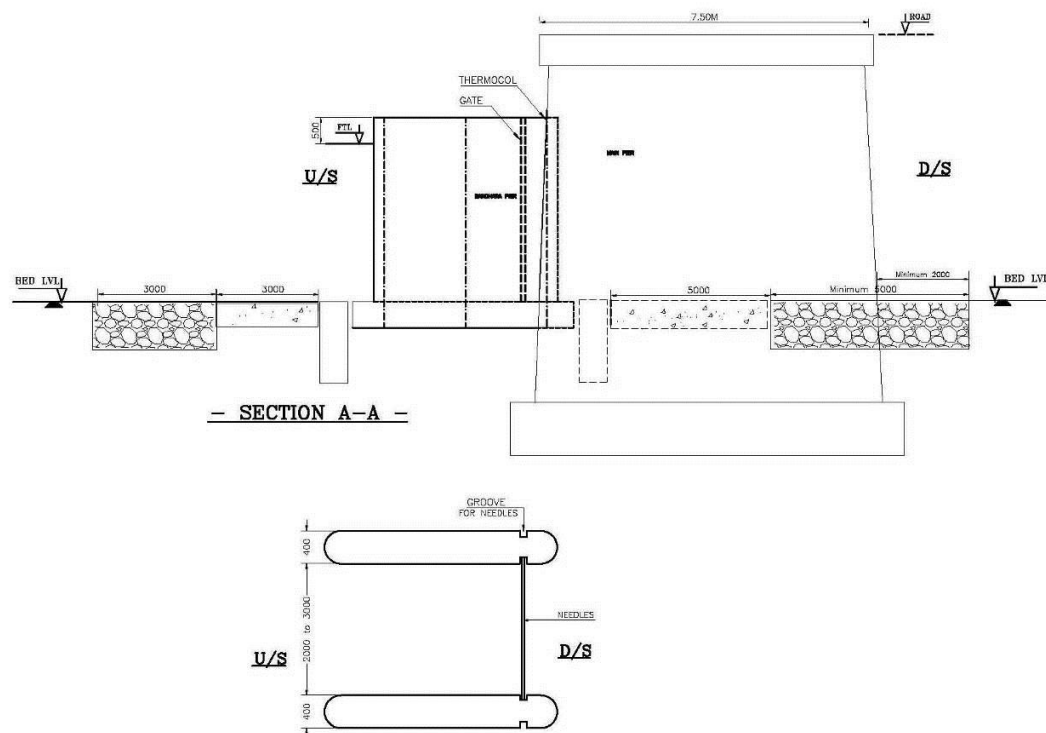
Typical Arrangement of *Bandhara*/Barrage Structure (Ingle, 2016)
